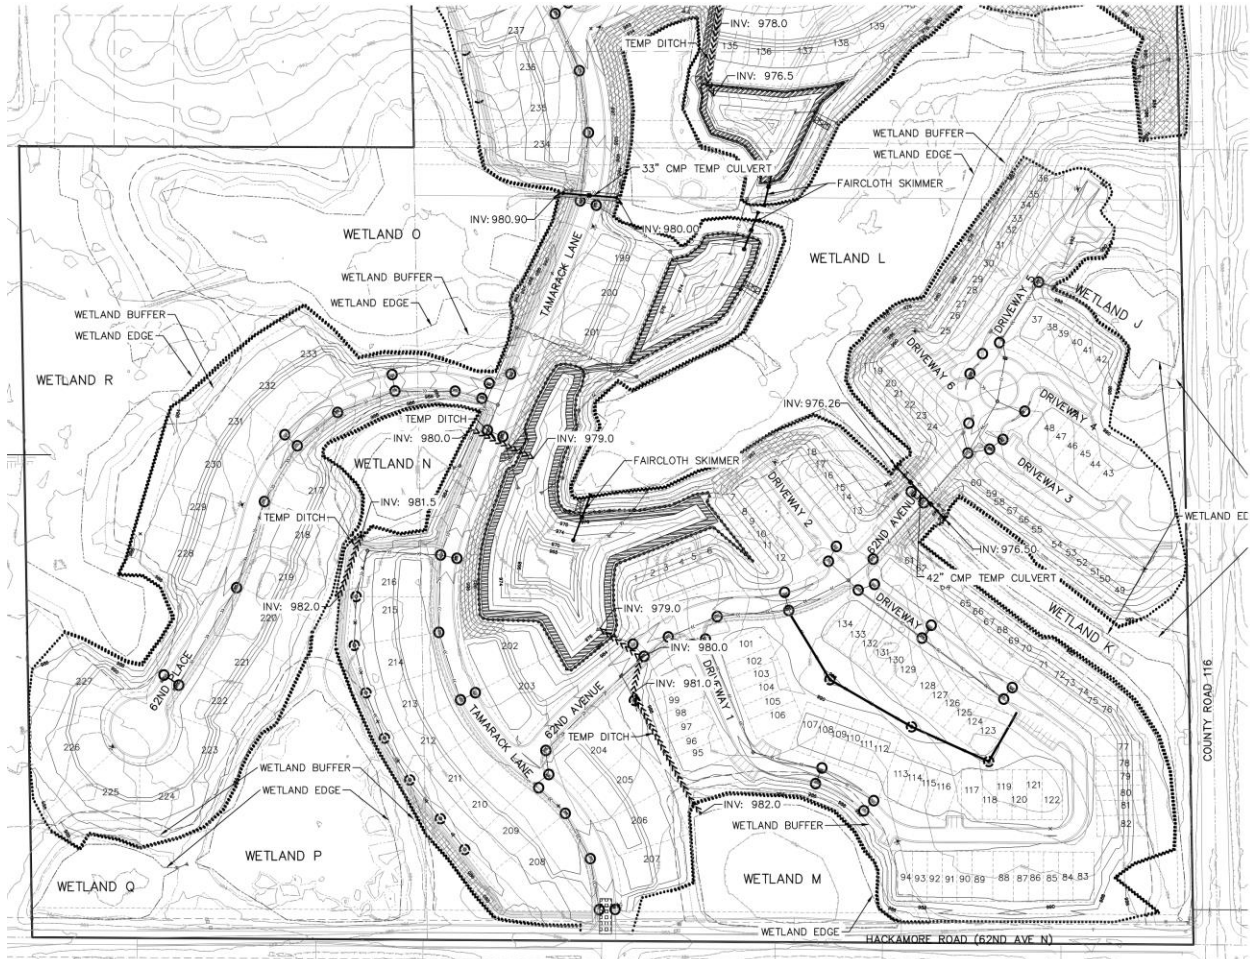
Phase 1 Erosion Control Plan – South Half of Site
